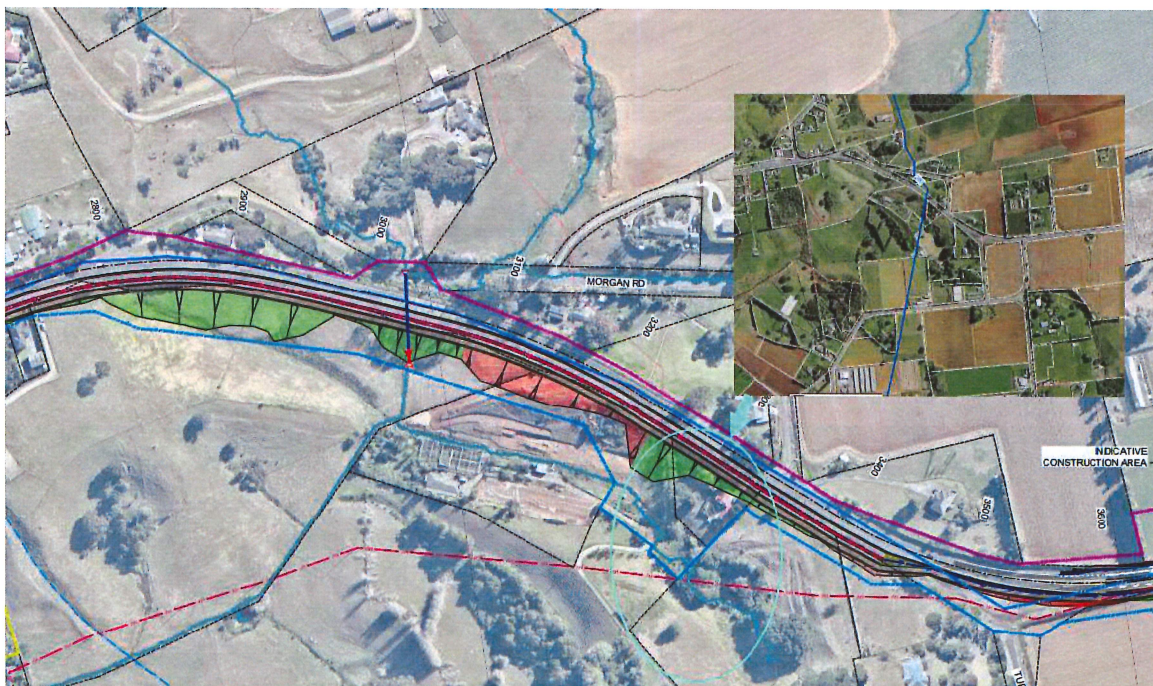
Snip from Sheet 1 of 2 *General Arrangement Layout Plan* with insert showing location of 200 pipeline not shown on plan.
